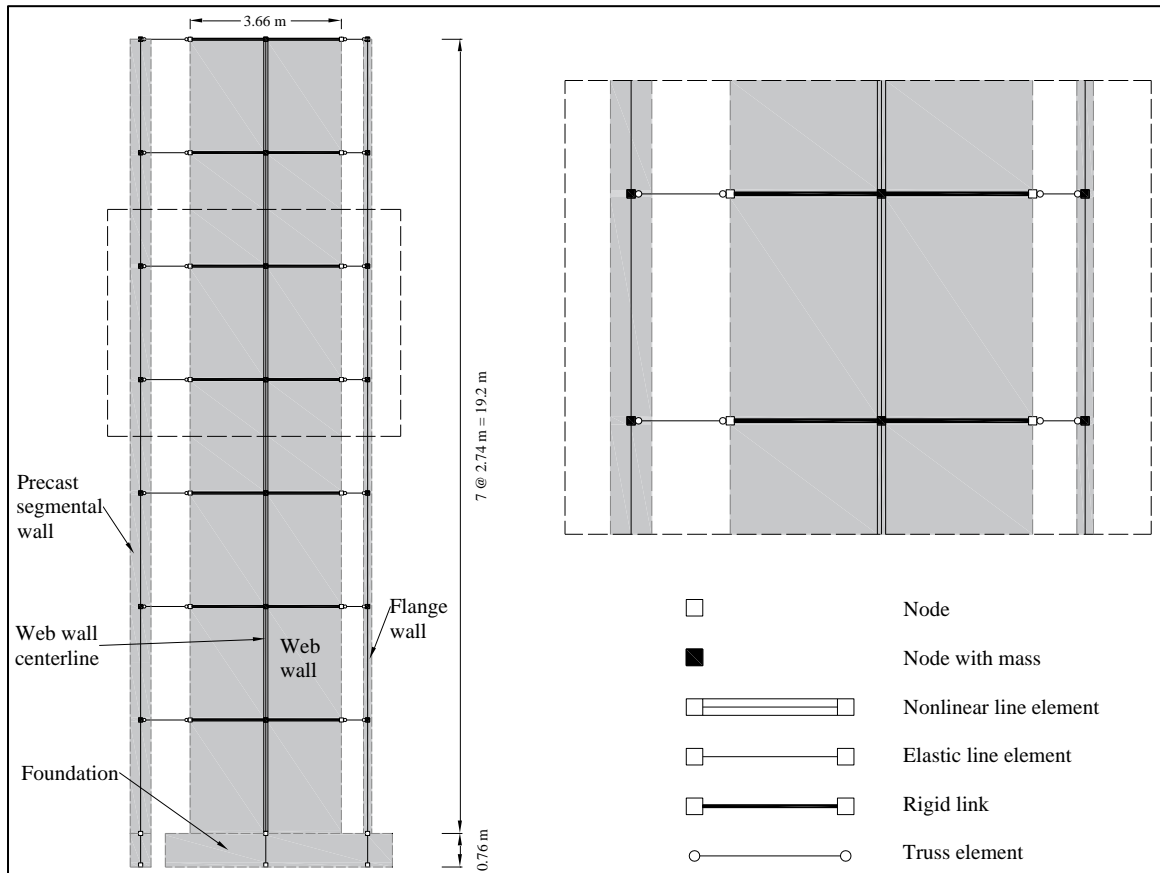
2D numerical model geometry of the 7-story wall building.
